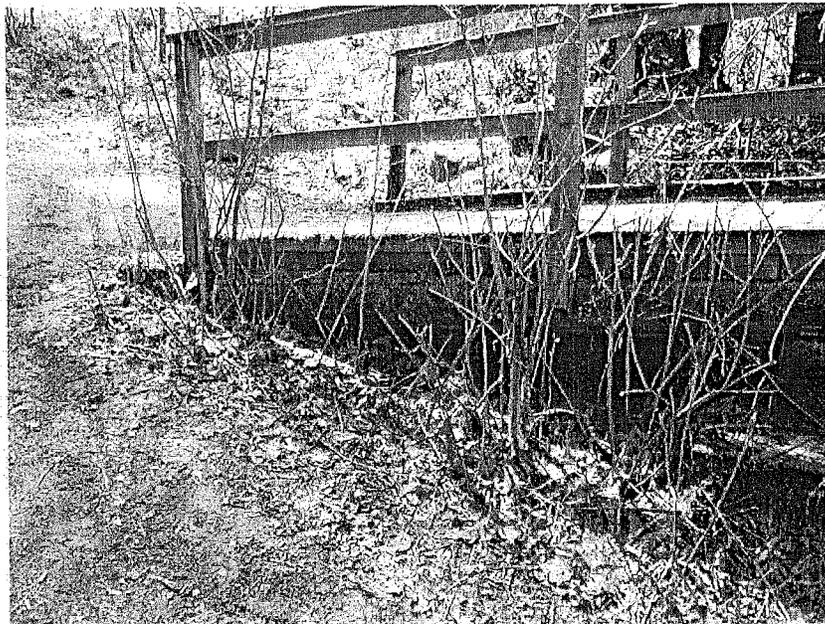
Eastern Approach Span (note stringers in contact with ground).
